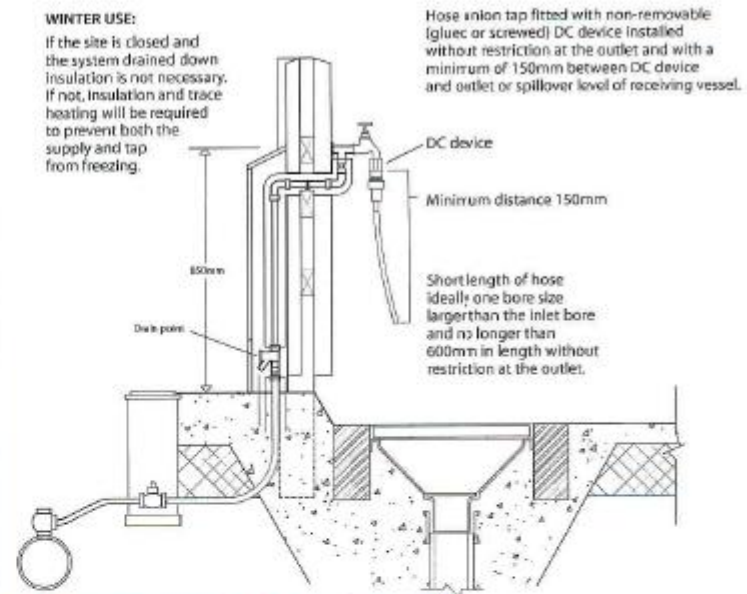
SECTION THROUGH WASTE WATER DISPOSAL GULLY
